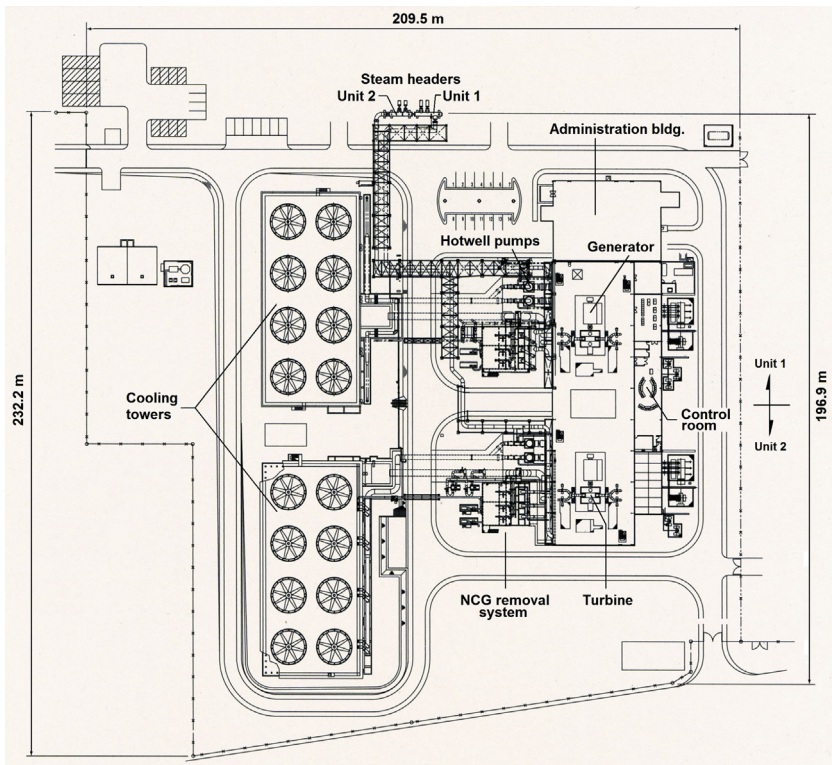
Power station layout plan for Wayang Windu Units 1 and 2. After Refs. [27,29].
